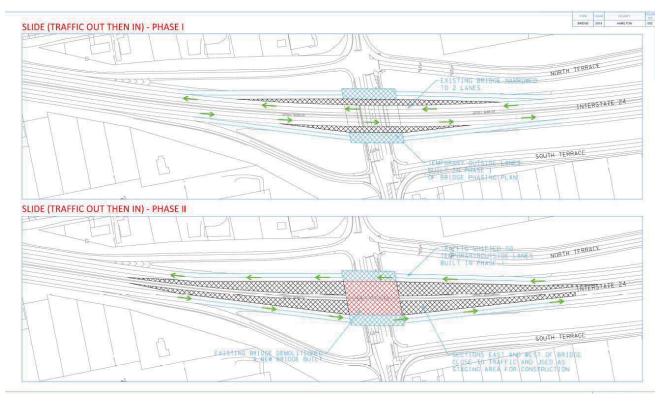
Traffic Control Plan for the I-24 Bridge over Germantown Road Slide (Traffic Out Then In) Option
